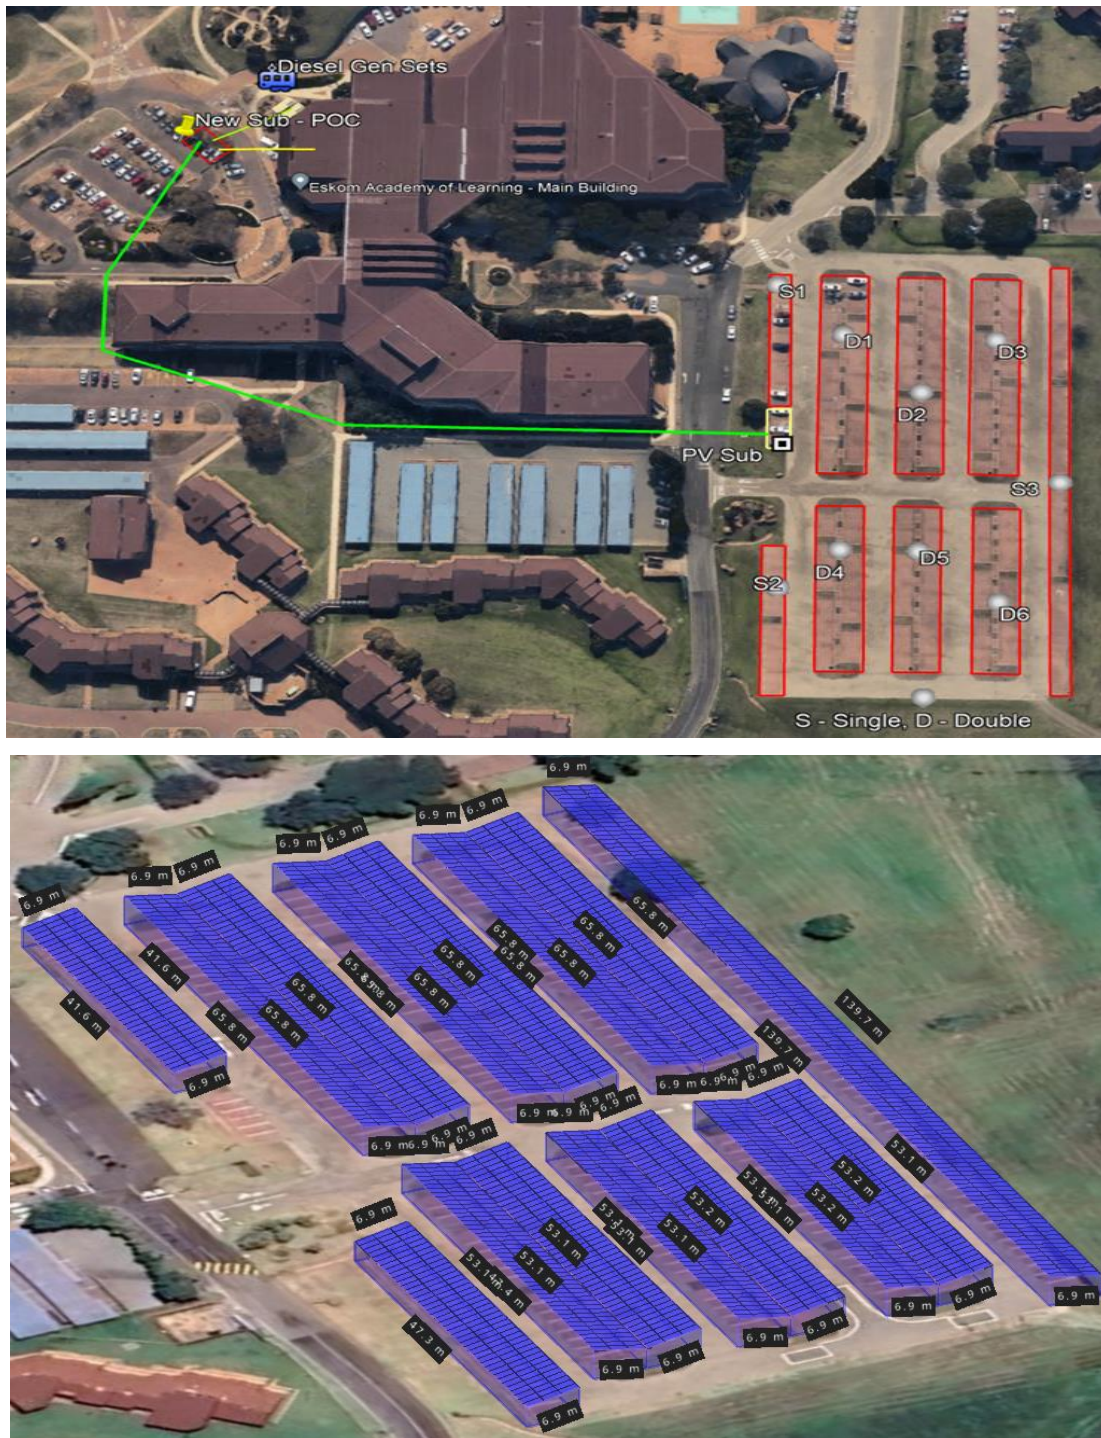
EAL Admin Carpark Aerial View and Solar PV Plant Indicative Layout
